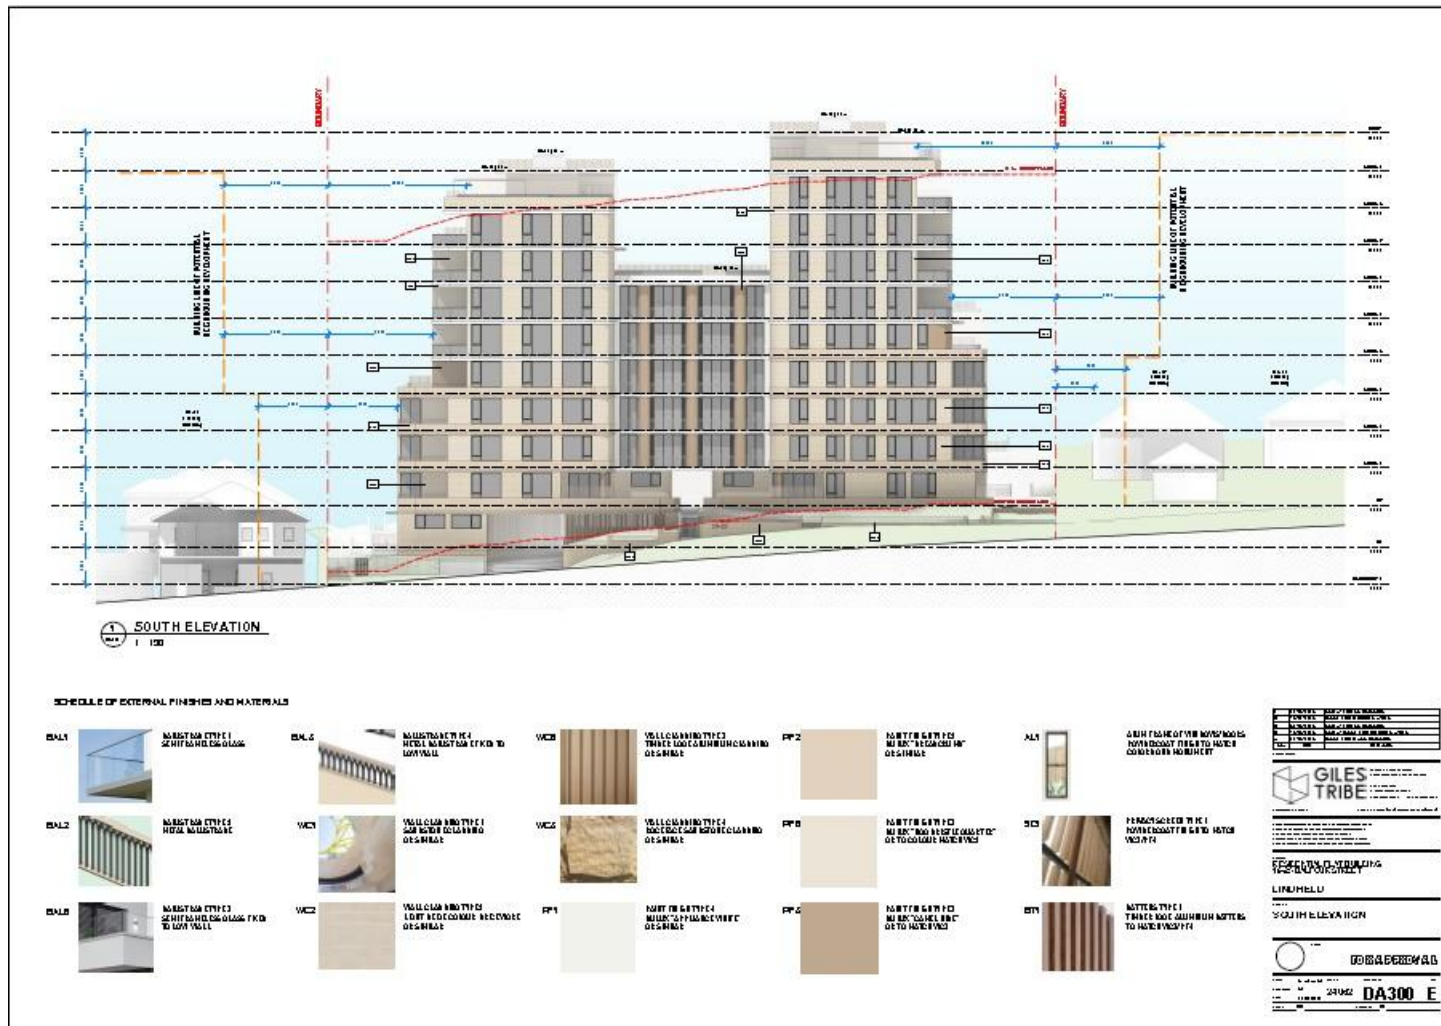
Revised image of South Elevation of proposed apartment building at 19 – 25 Balfour Street, Lindfield (for detail see Giles Tribe Architects 2026)
